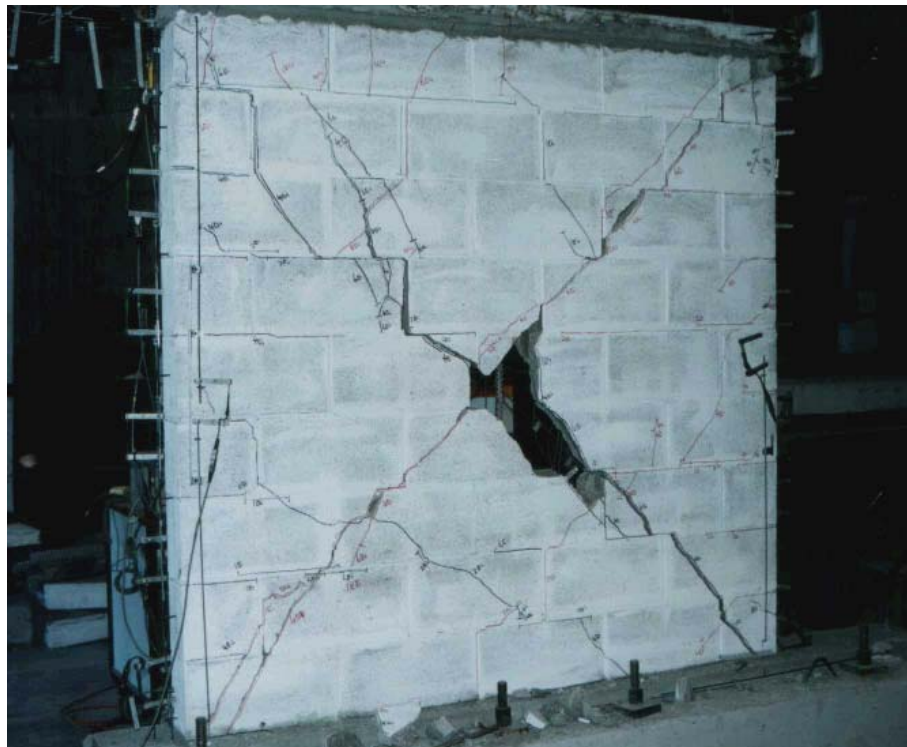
Series A, condition of Wall A2 at end of testing.
